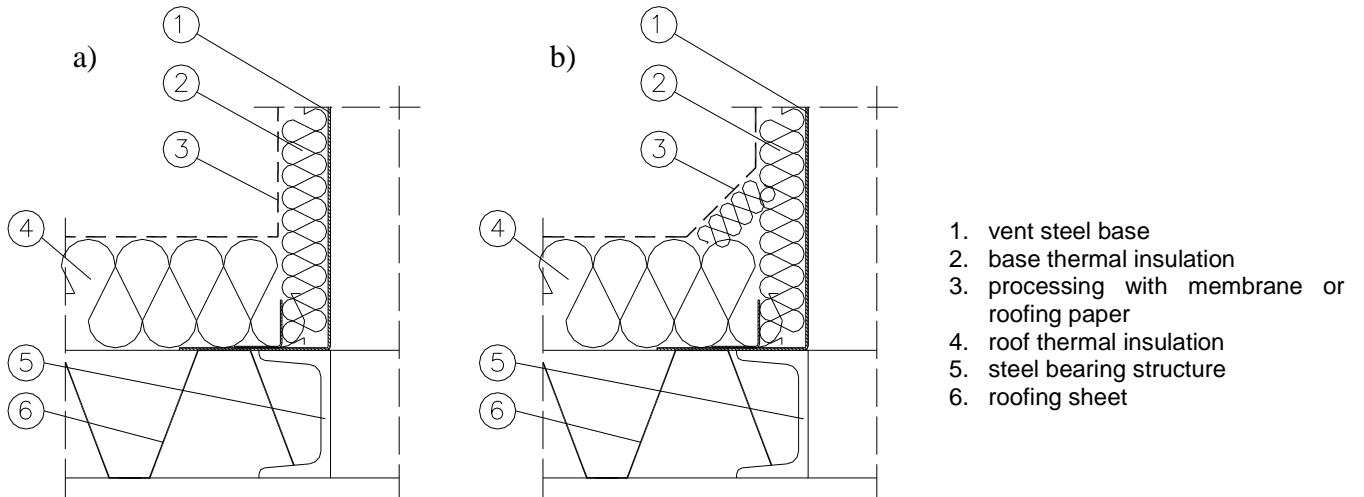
Steel base on steel structure (a - membrane flashing, b - roofing paper flashing)
